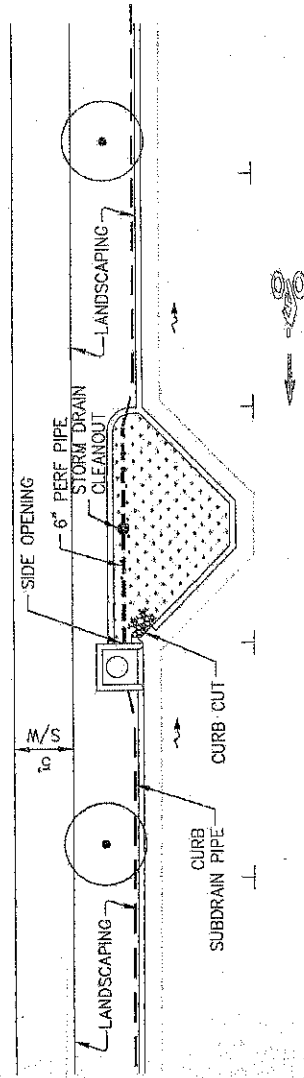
B - MITCHELL AVE. TYPICAL BIORETENTION DETAIL
